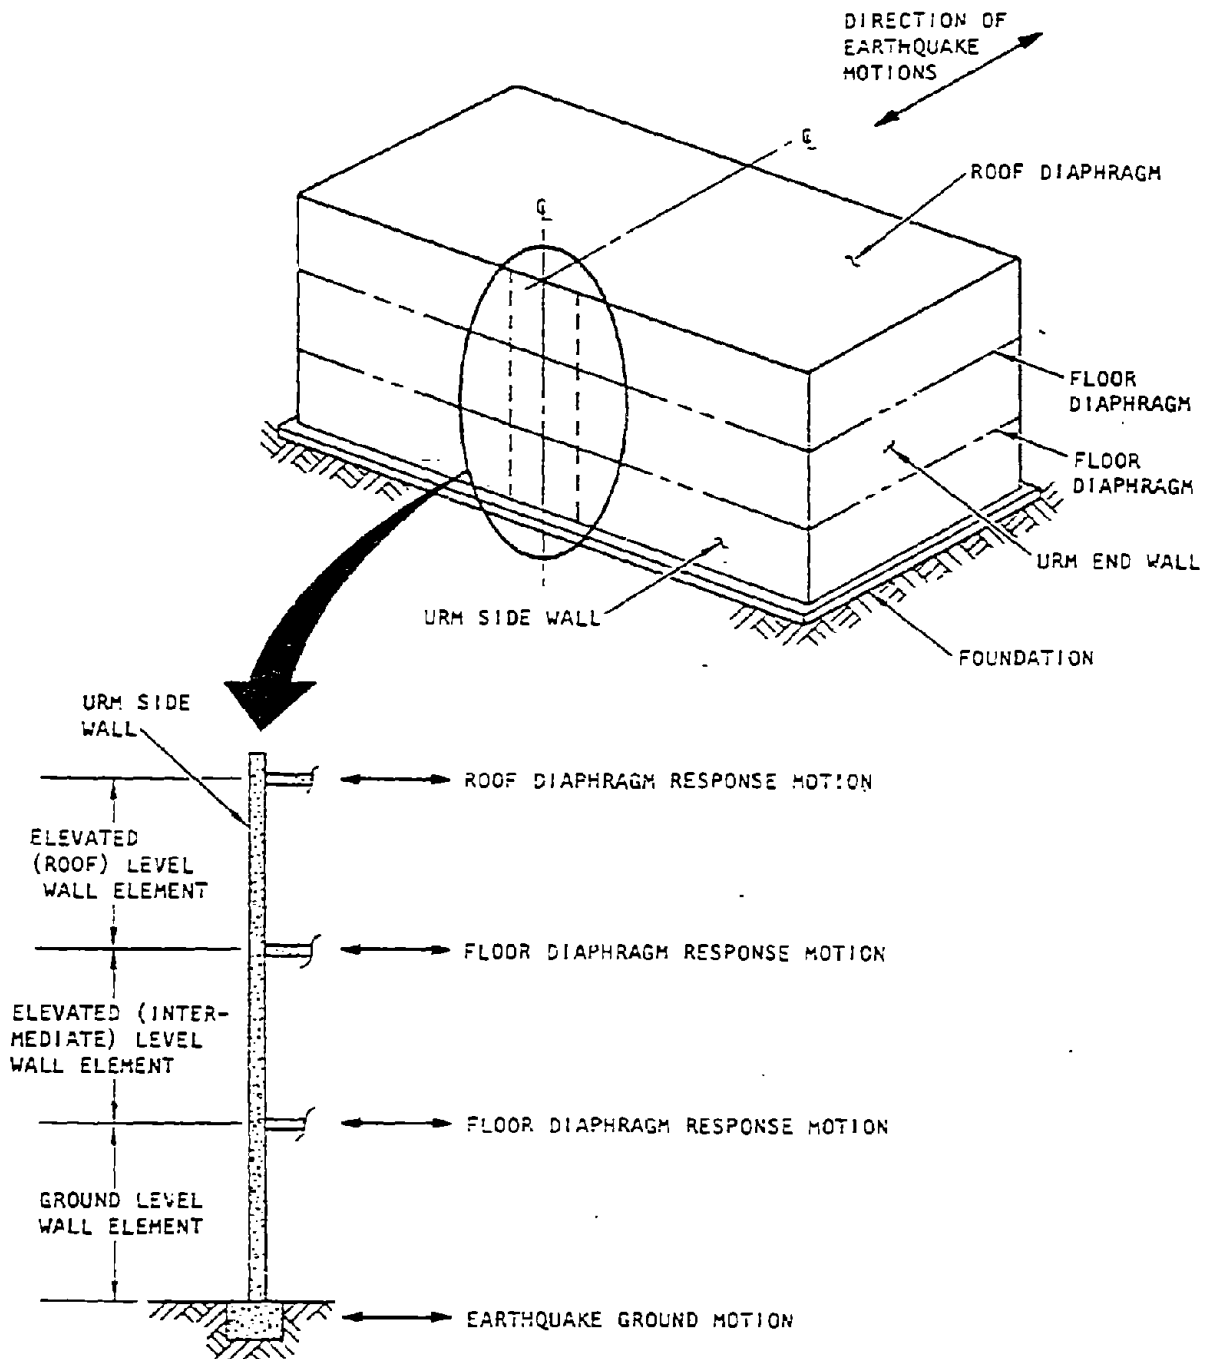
WALLS, OUT-OF-PLANE, MULTI-STORY BUILDING
